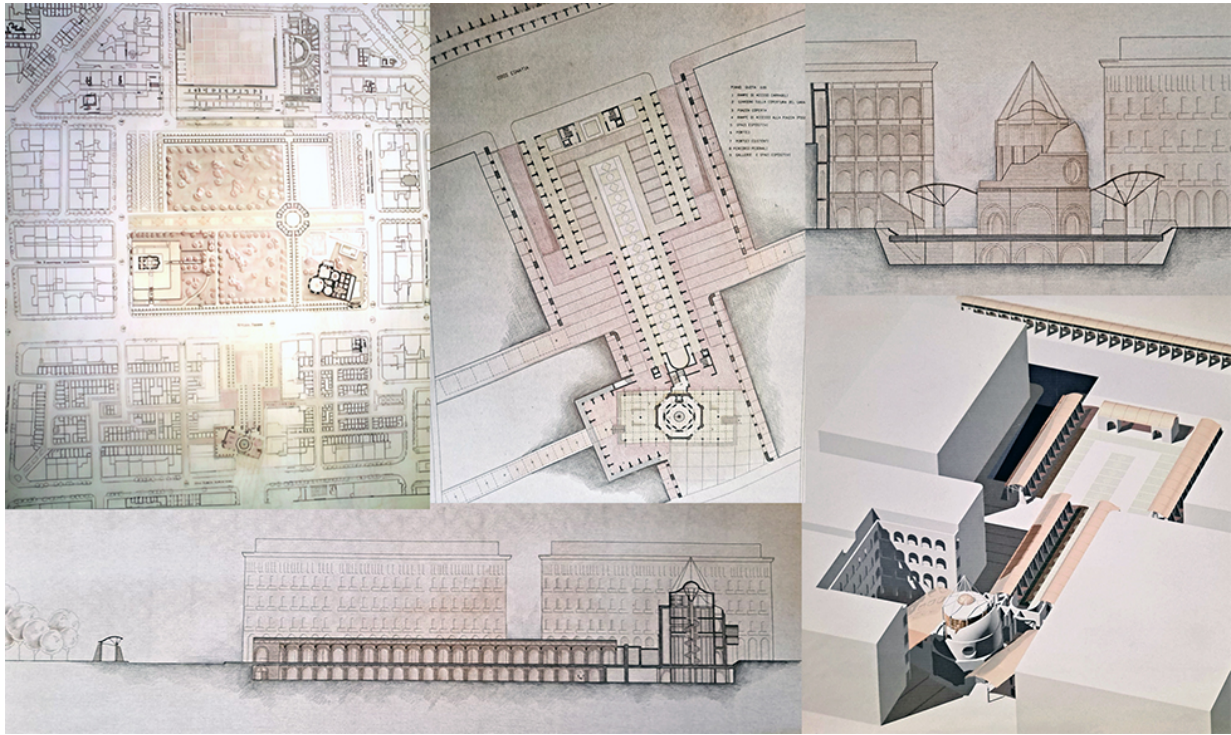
Design proposal's masterplan, floor plan, cross-sections, and axonometry. (Source: Authors' archive, 1997; Maurizio Crocco 3D elaboration, 2025).
